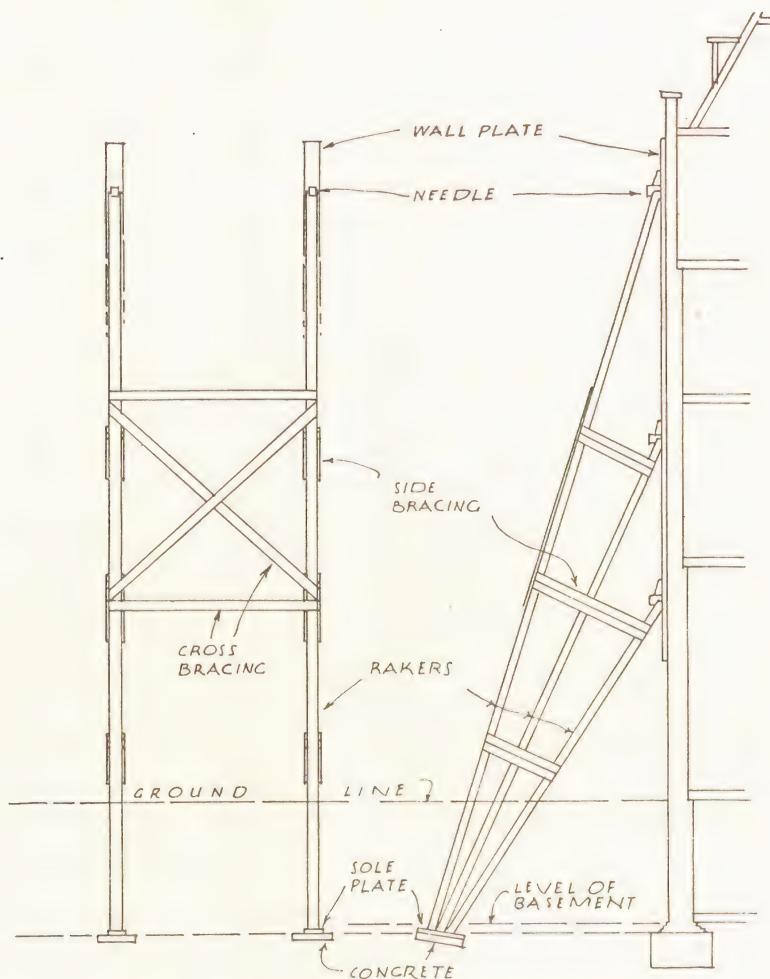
Multiple raking shore. The elevation on the left shows two sets of shores cross braced.
